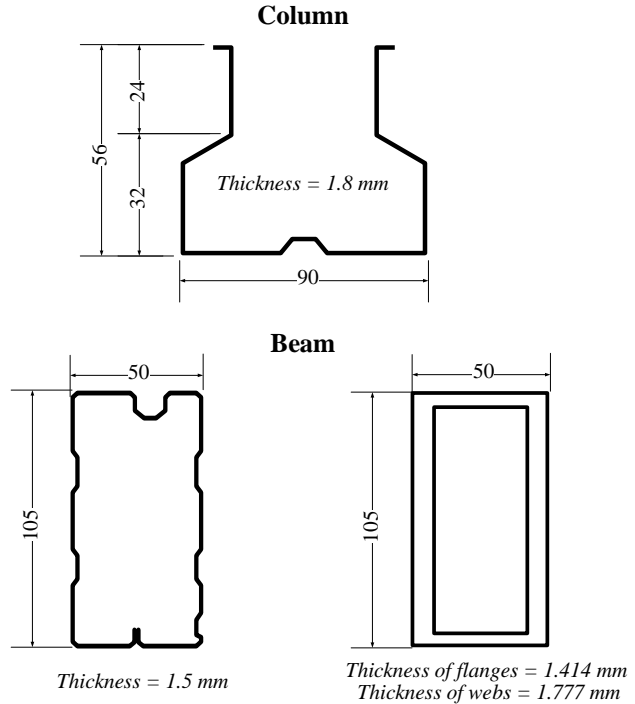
Cross-section of the column and cross-sections of the beam: the original (left hand side) and the adopted in this study (right hand side).
